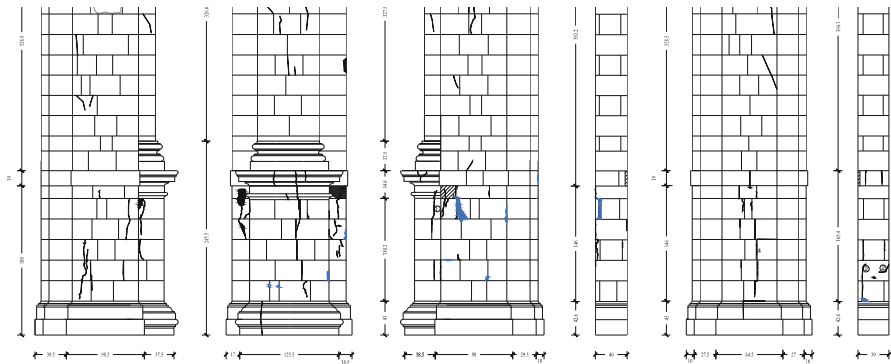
Typical crack pattern of a pillar under heavy compressive stresses
